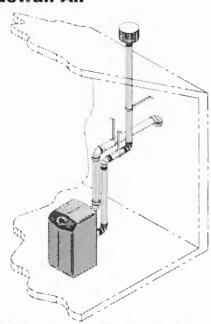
Stainless Steel Vertical Vent, Sidewall Air - See page 20 for more details
